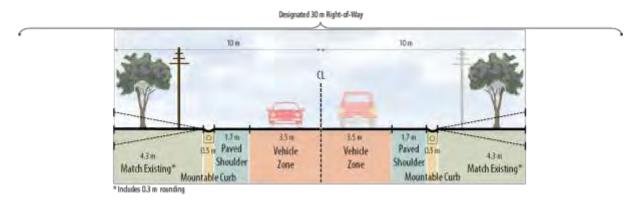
11.4 m Platform Semi-Rural Cross-Section for Mississauga Rd. / Old Main St.
